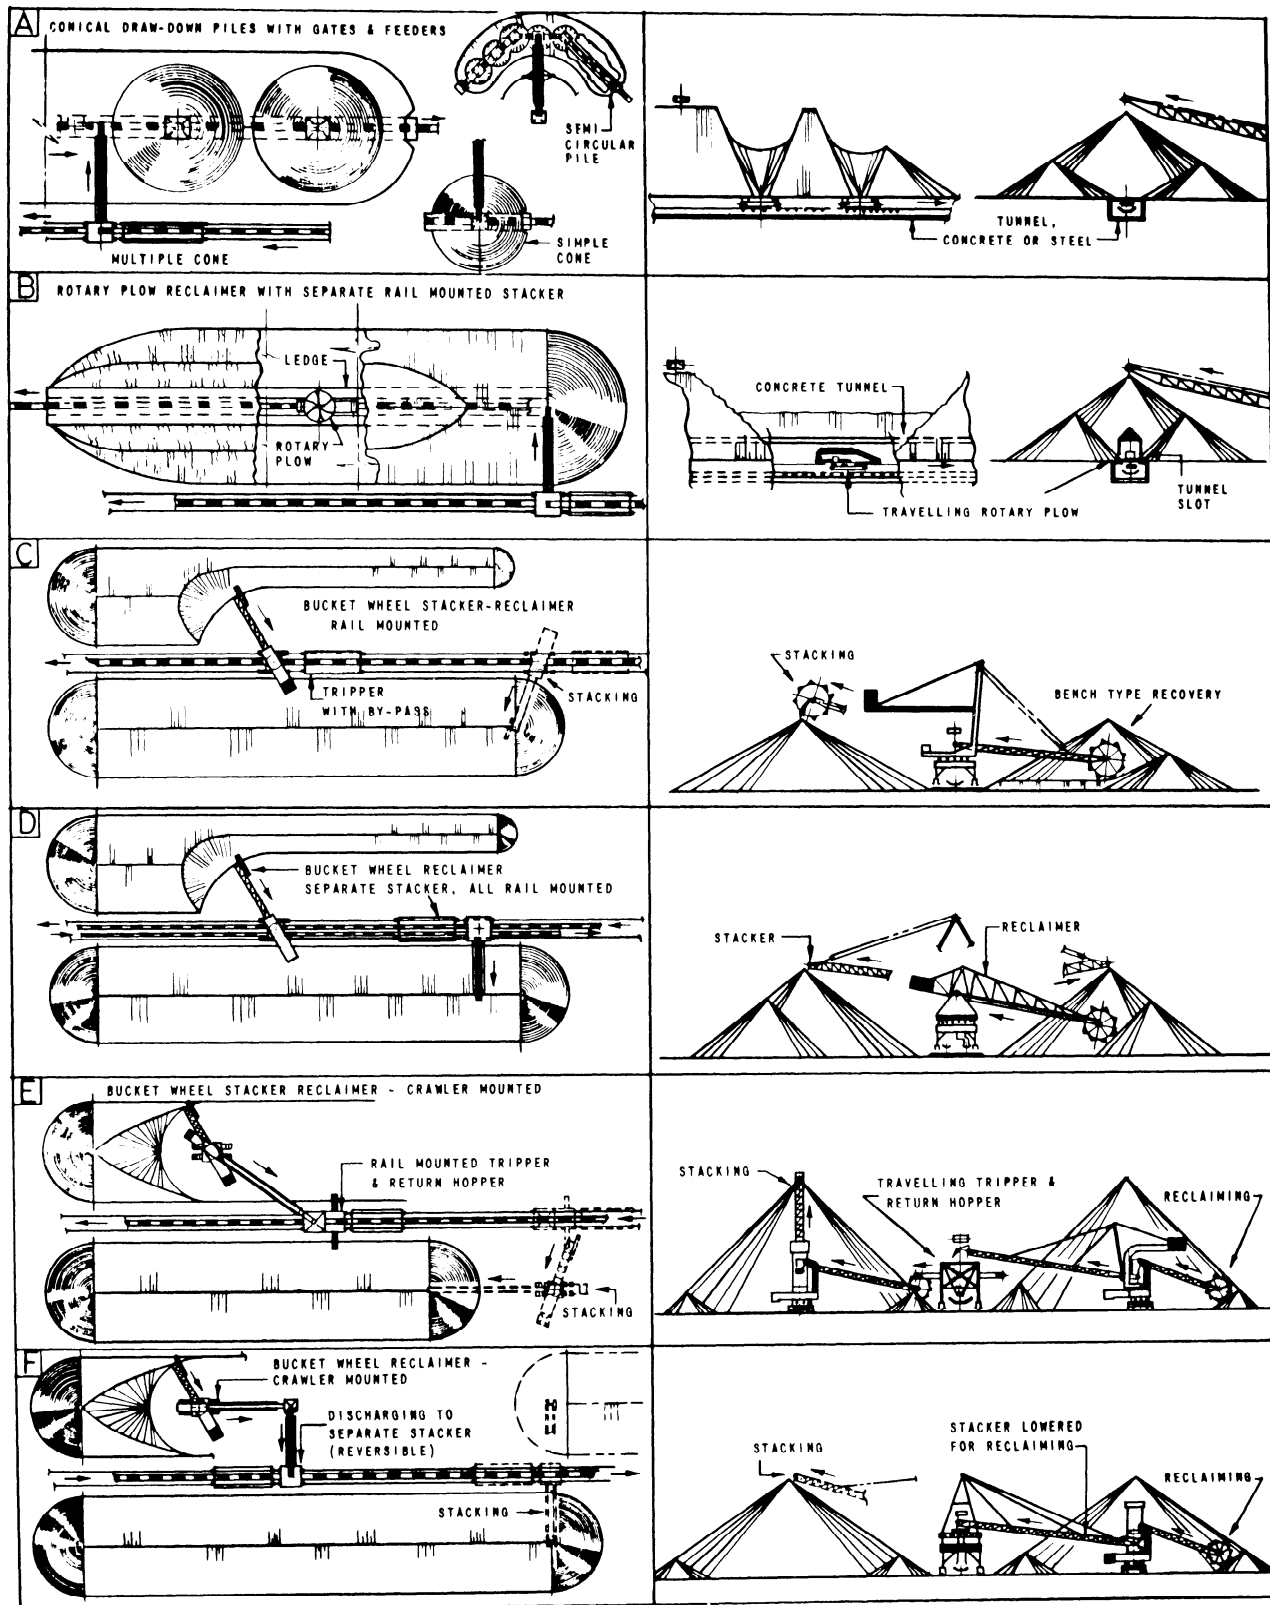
Open storage system layouts. A. Gravity-fed conical draw-down piles with gates and feeders. B. Rotary plow reclaimer with separate rail-mounted stacker or alternate supported overhead conveyor with shuttle conveyor. C. Bucket wheel stacker-reclaimer, rail-mounted. D. Bucket wheel reclaimer with separate stacker, all rail-mounted. Stacker on inside or outside tracks. E. Bucket wheel stacker-reclaimer, crawler-mounted. Rail-mounted tripper and return hopper. F. Bucket wheel reclaimer, crawler-mounted. Rail-mounted stacker, reversible.
